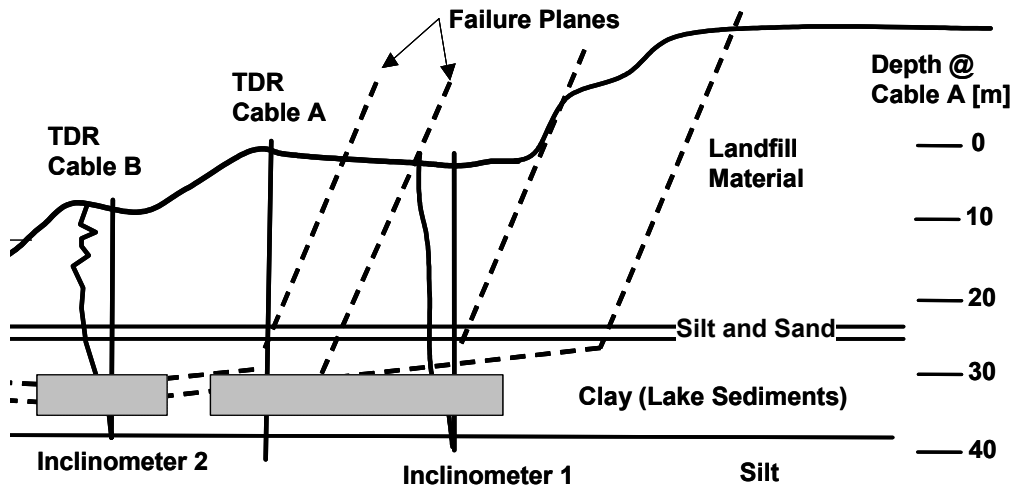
Profile of landfill, showing locations of inclinometers, TDR cables and hypothesized shear failure planes.
